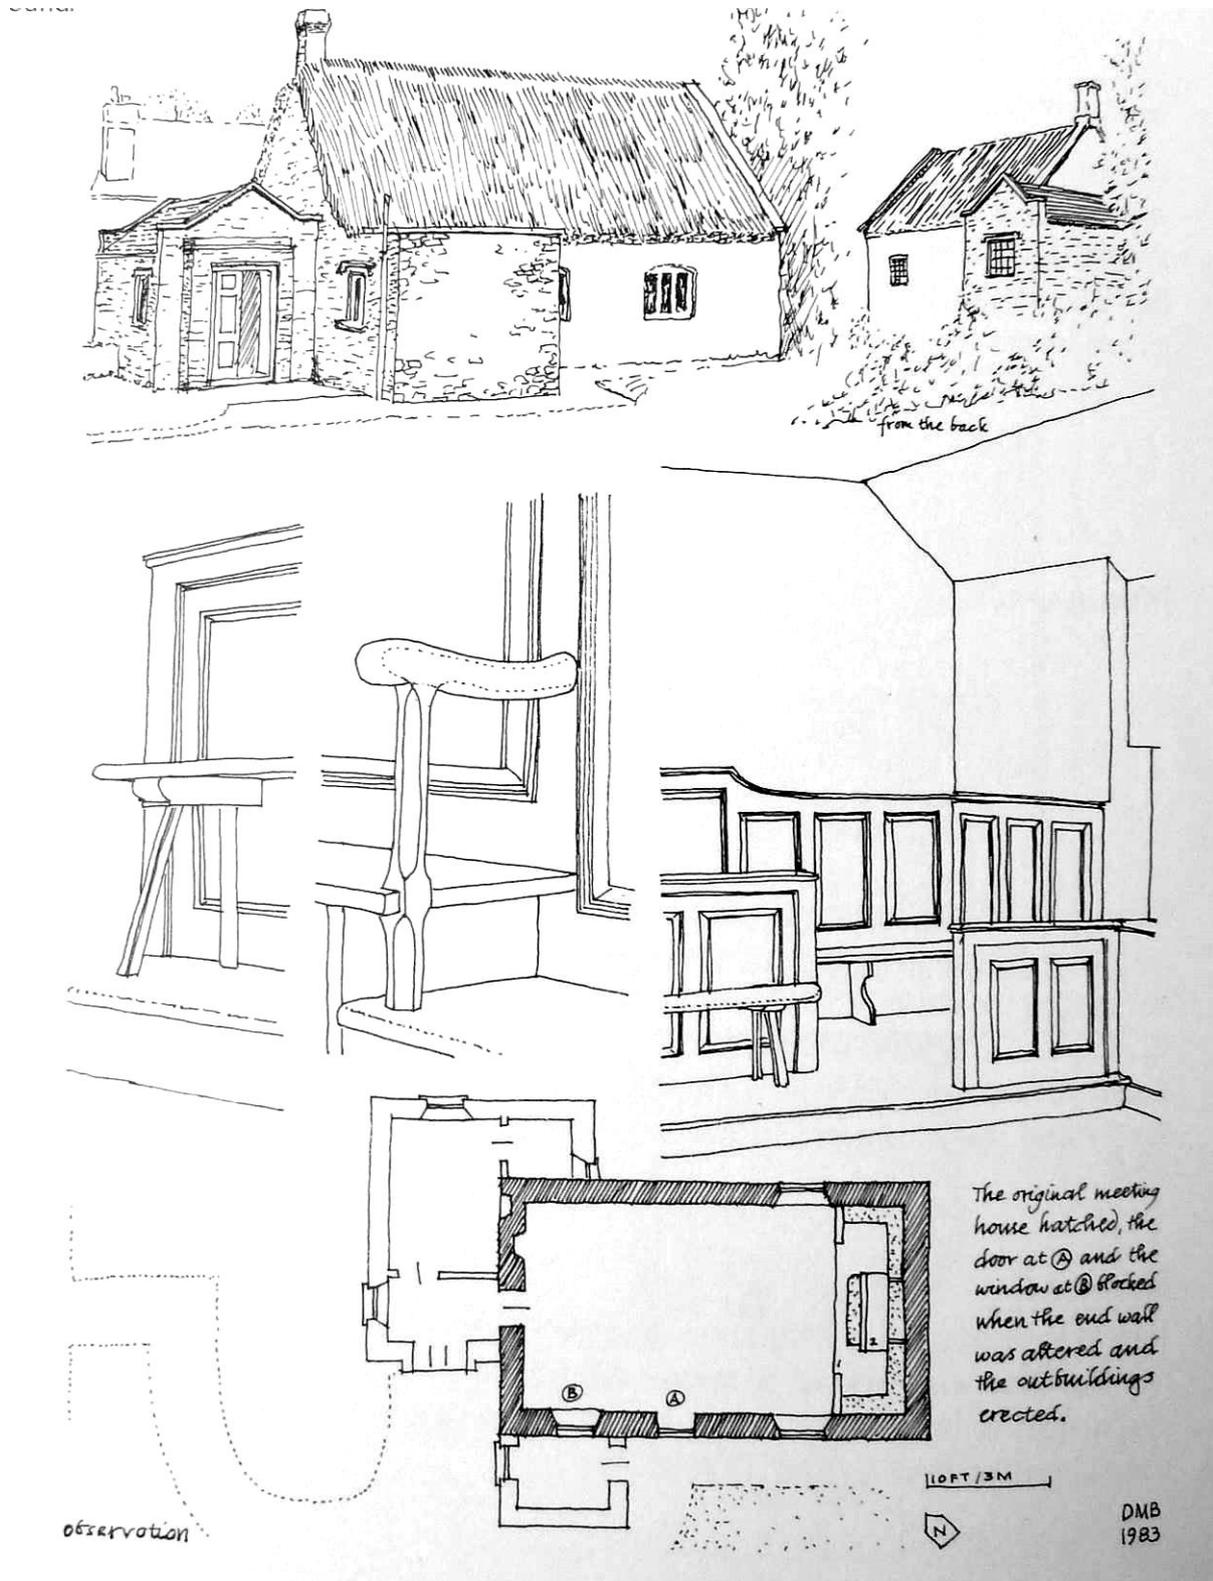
Plan, elevation and details, from Butler, Vol. 2, 1999, p.542
